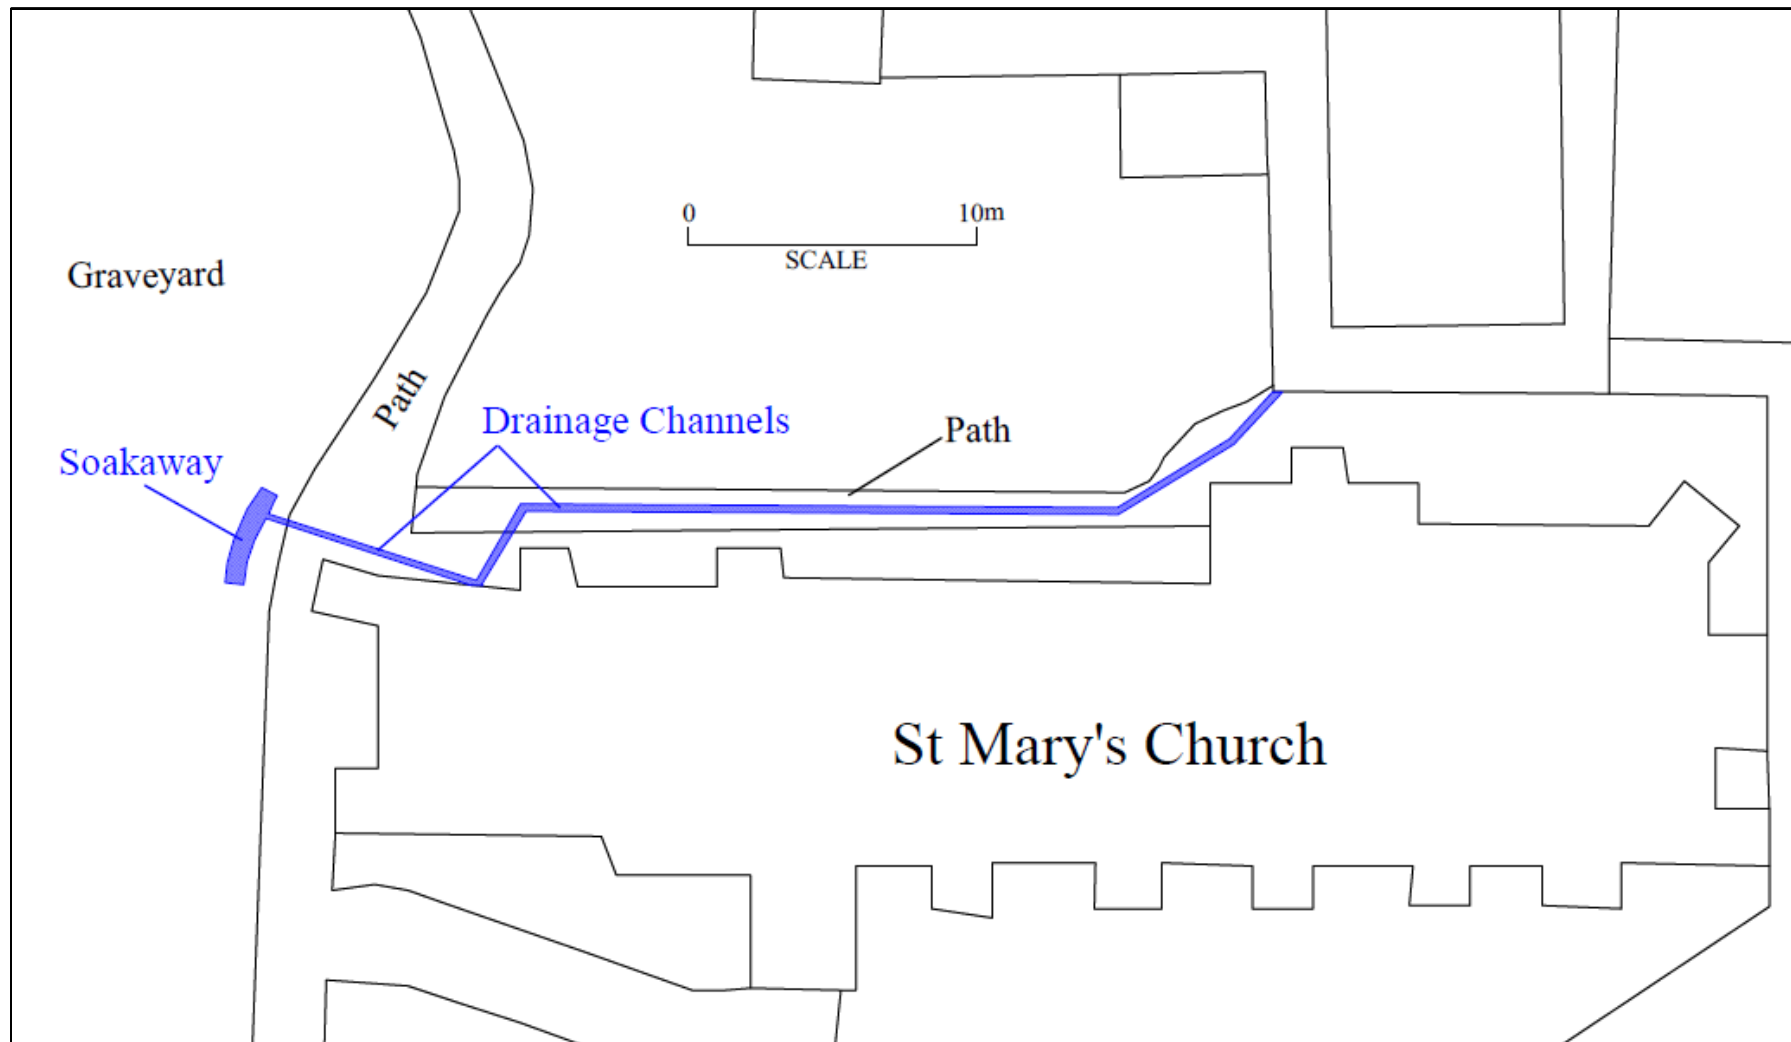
Plan of the works (shown in blue) at St. Mary's Church, Cardigan
